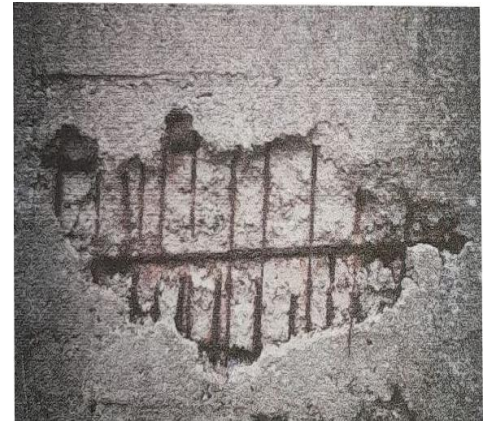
Rehabilitation of Spalled of Concrete
